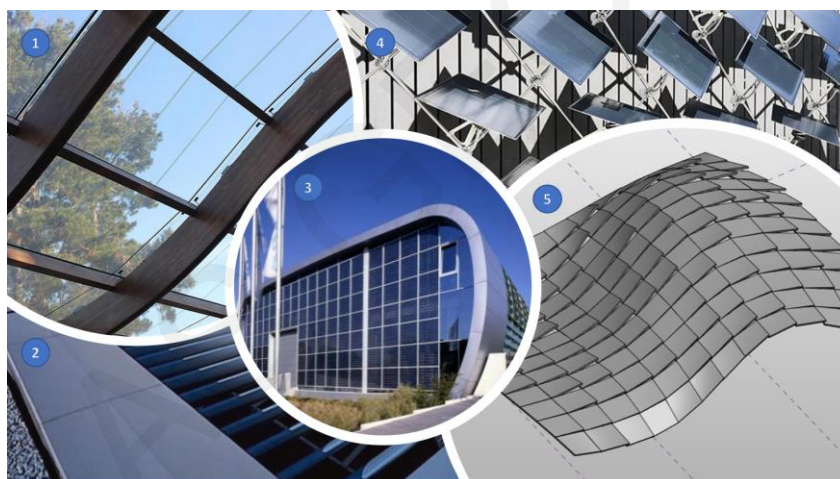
1) Adjustable roof suitable for sunlight, 2) Adjustable wing roof for air circulation, 3) Aesthetic building view, 4) Movable photovoltaic Wall, 5) Adjustable building shell.
